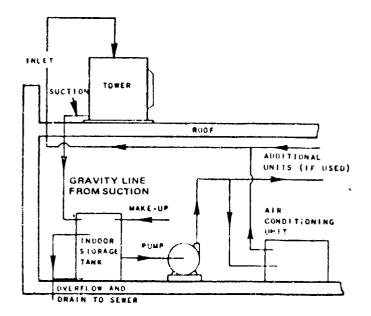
Flow Diagram for a Cooling Tower with Indoor Storage Tank. (Piping Is Arranged So That Tower Basin Will Drain When Pump Is Shut Off.)
